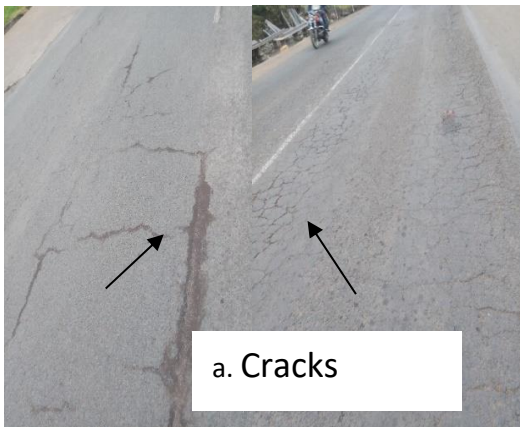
cracks: Defects on RTI along the Olembe-Nkometou 1, stretch of road.
